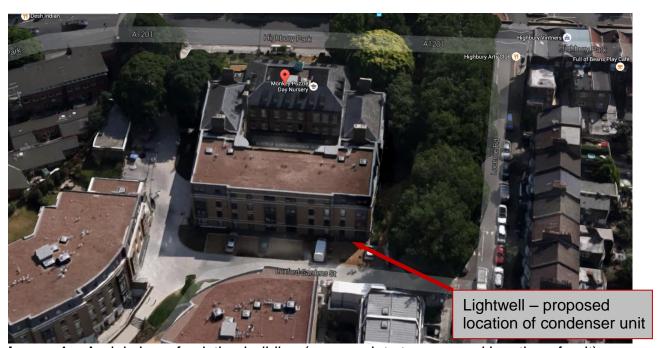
Aerial view of existing building (arrow points to proposed location of unit)
